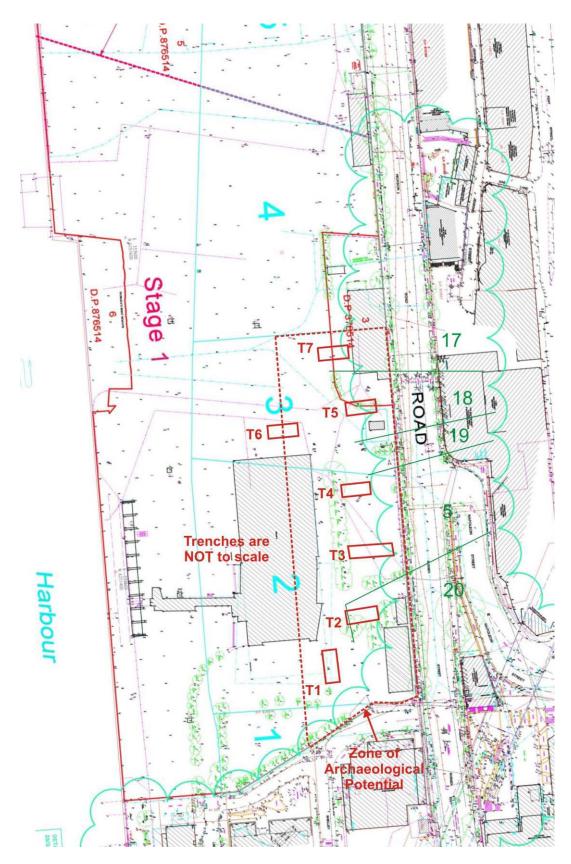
Plan showing the proposed location of test trenches in the eastern area of the site. Please note these trenches are not to scale.
